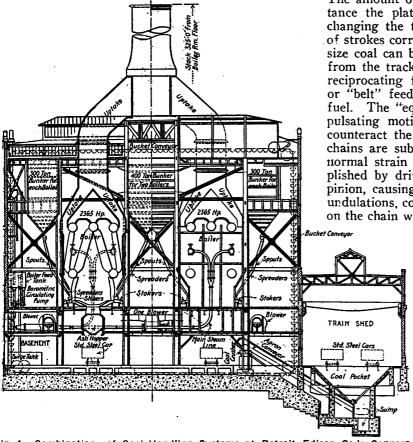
Combination of Coal-Handling Systems at Detroit Edison Co.'s Connors
